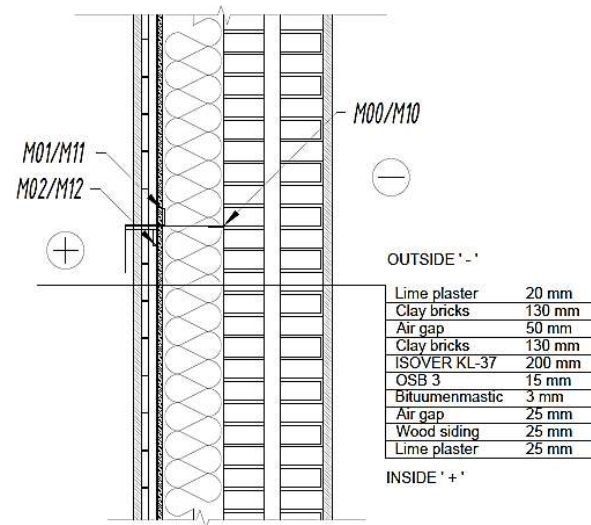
The cross-section of the insulated wall and installed sensors between layers.
